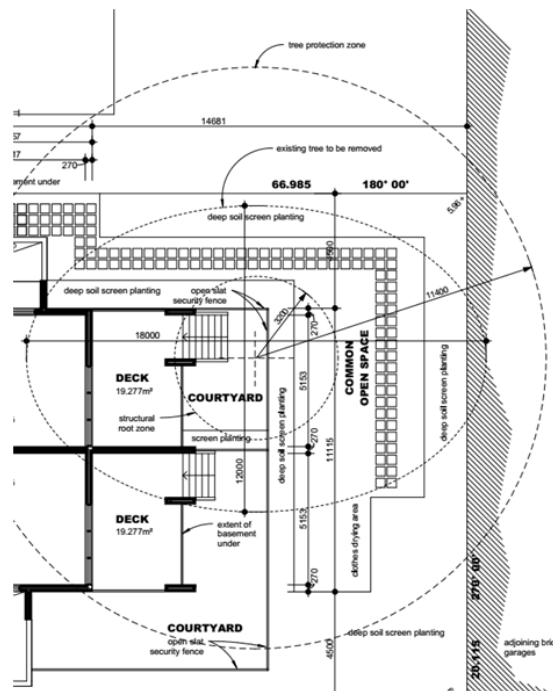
Ground Floor Plan showing (from centre) the structural root zone, canopy spread, and tree protection zone, of the existing *Jacaranda mimosifolia* (MacGillivray Architects, 2017)
